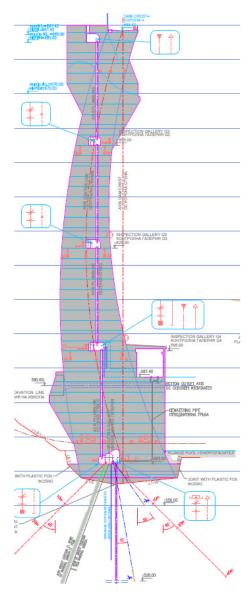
Central block cross section of Tsankov Kamak Dam, with spillway, bottom outlet gate house and plunge pool integrated into the dam body
